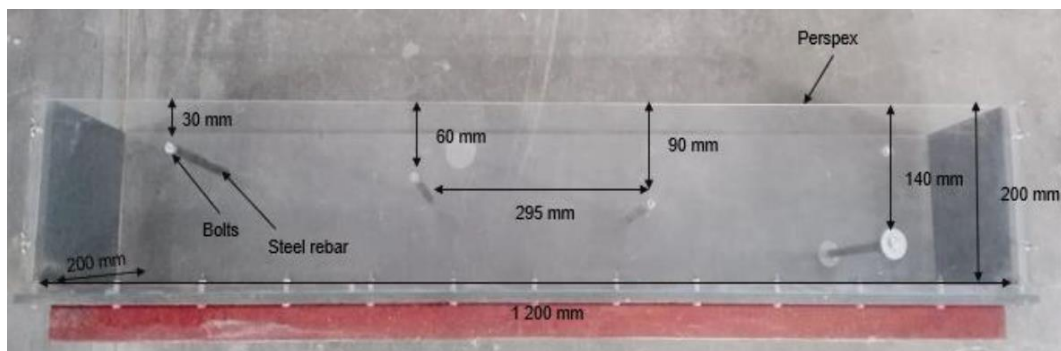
Beam mould used for preliminary experiment, with dimensions
